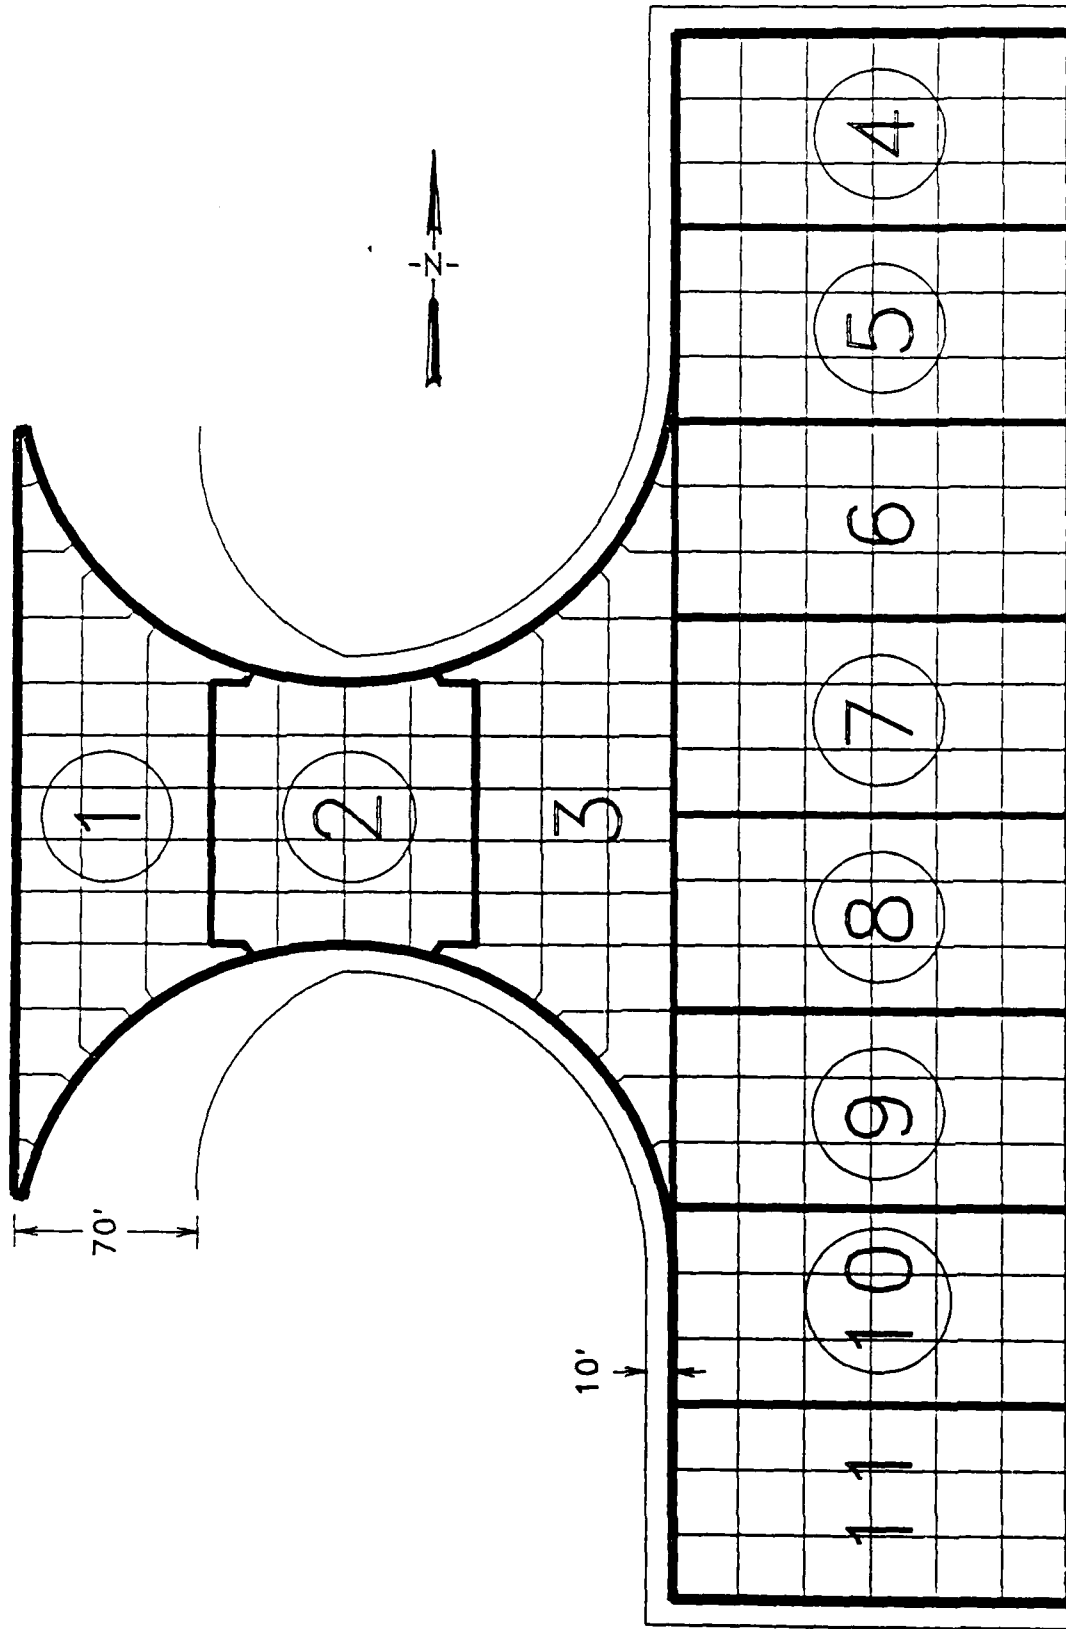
Sample unit layout, Pad 19 (feature A29B)
